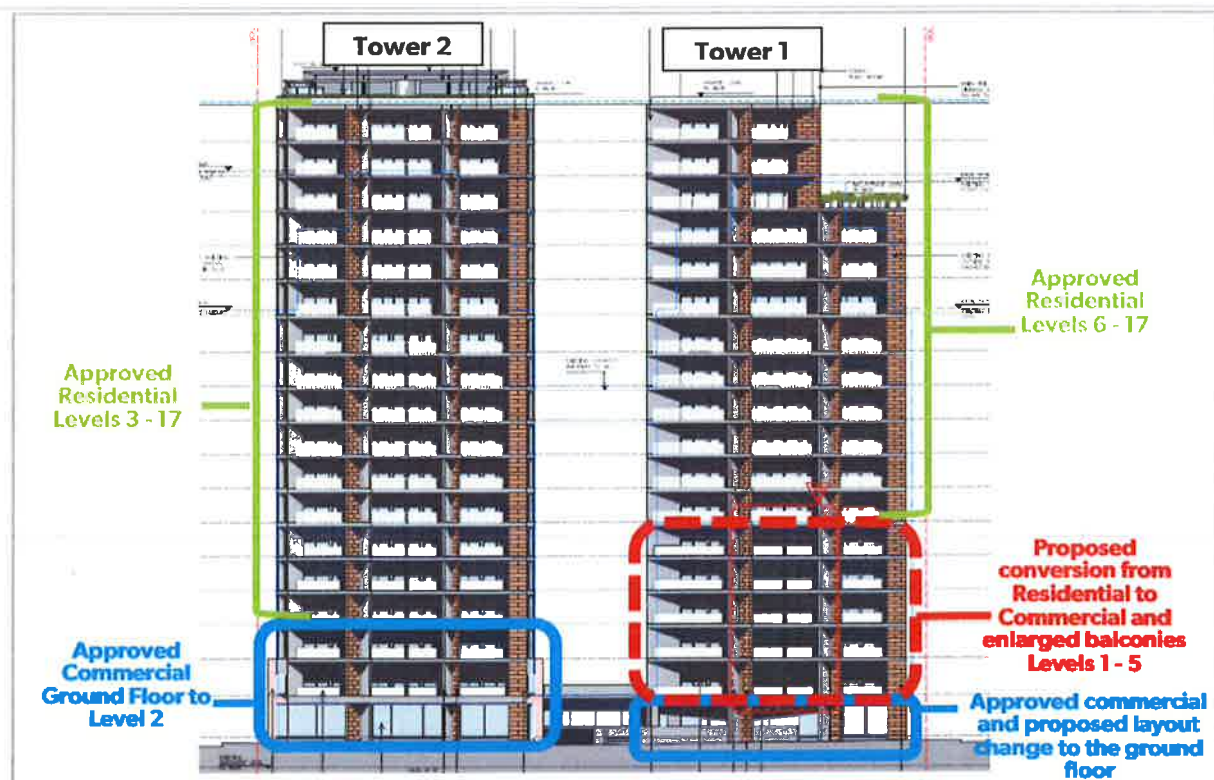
| Northern elevation showing proposed uses (Base source: RtS)
